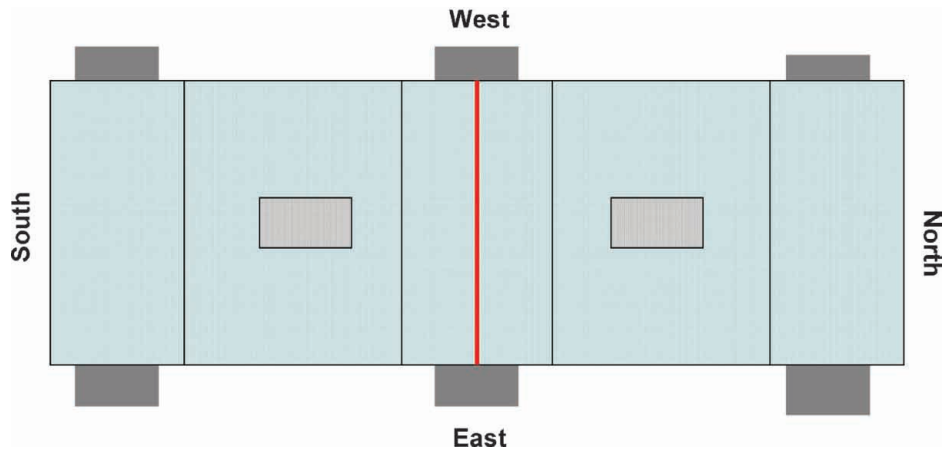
Placement of Top Plates in Wearing Surface Specimen
